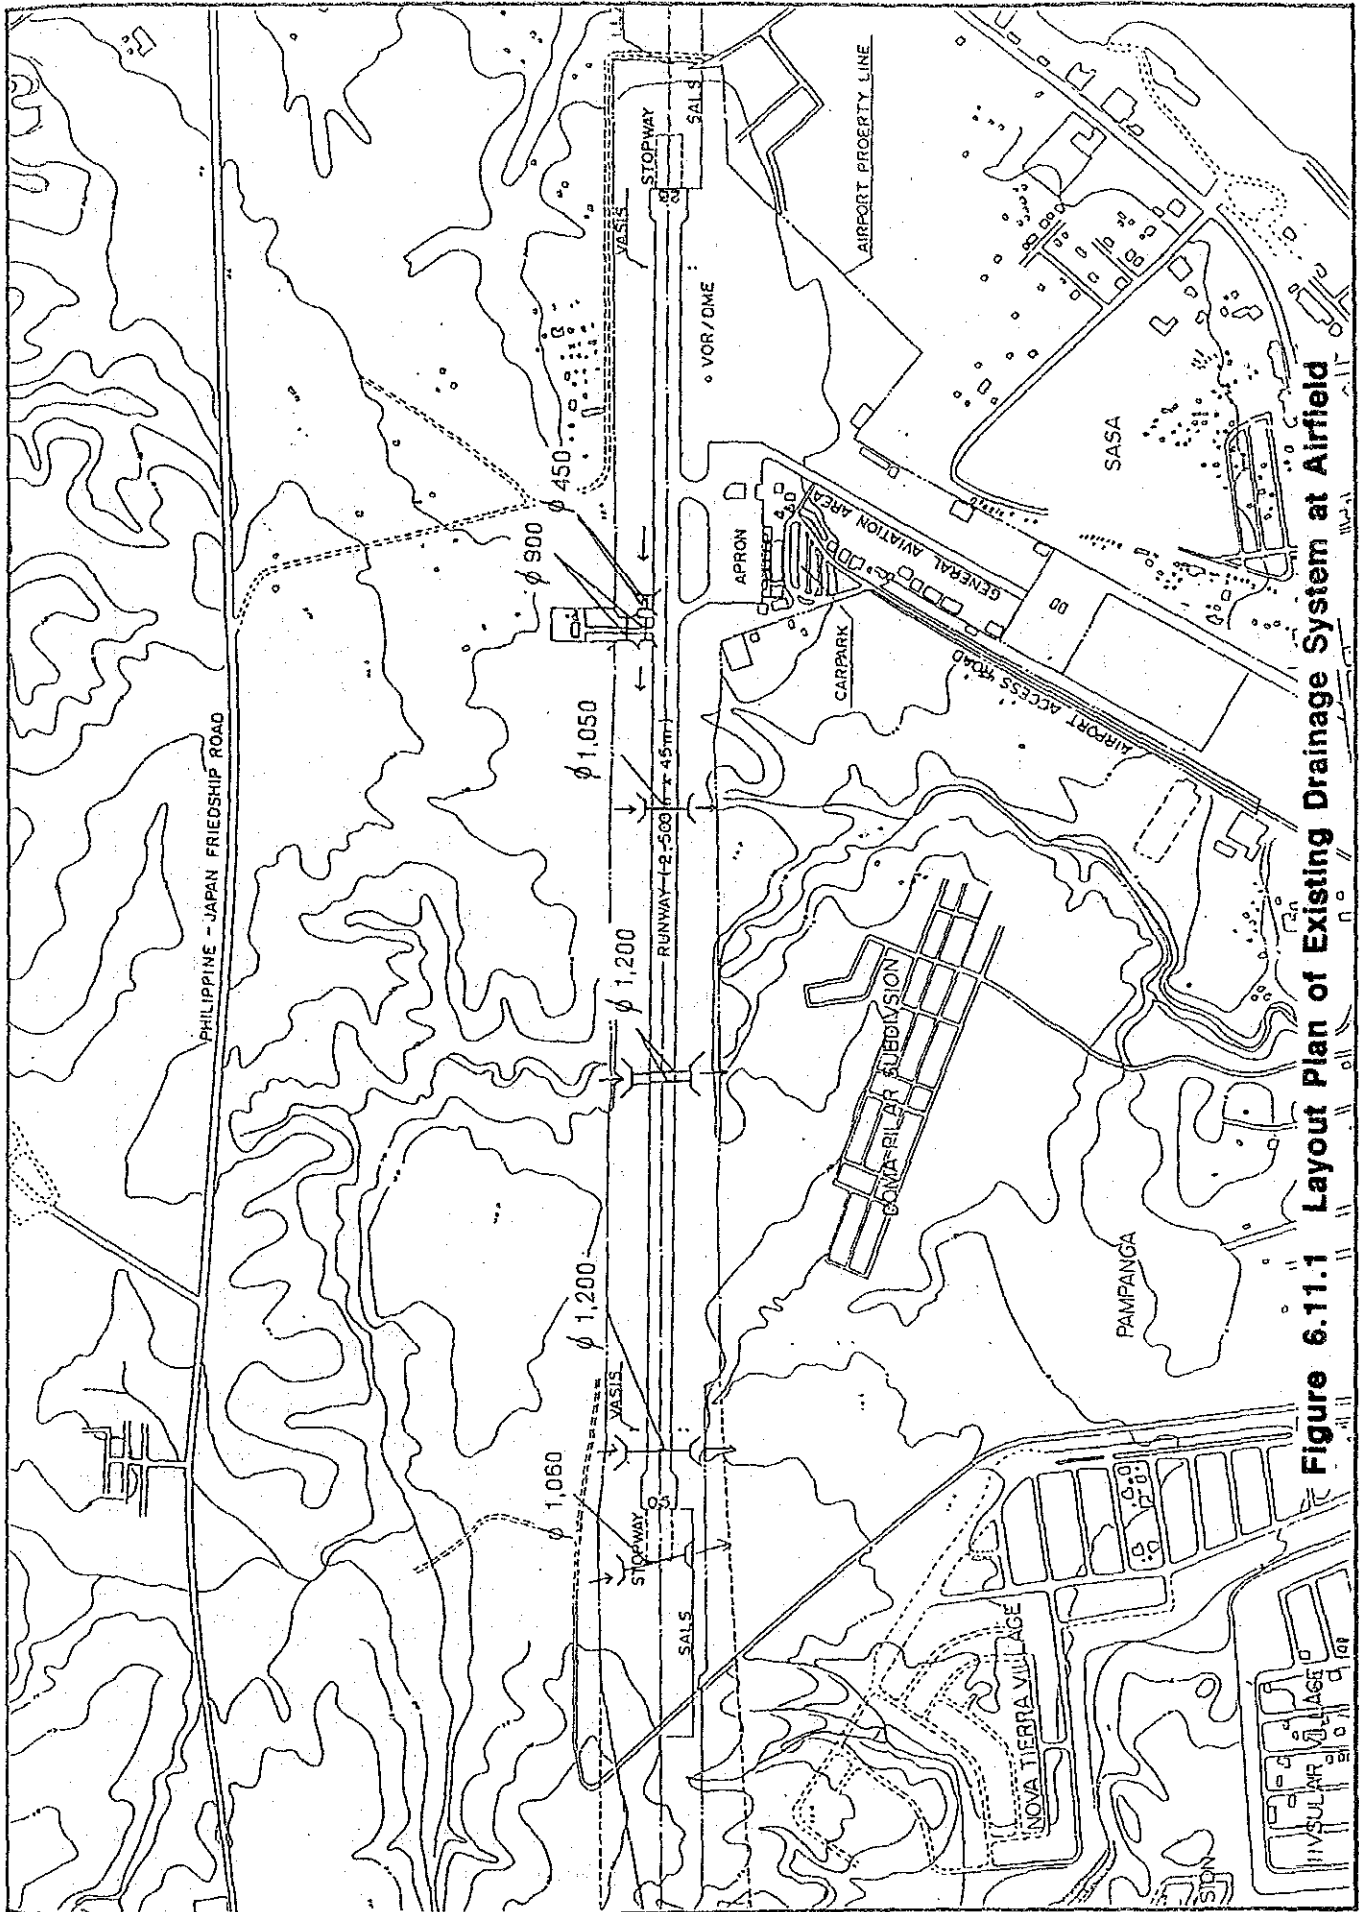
Layout Plan of Existing Drainage System at Airfield
